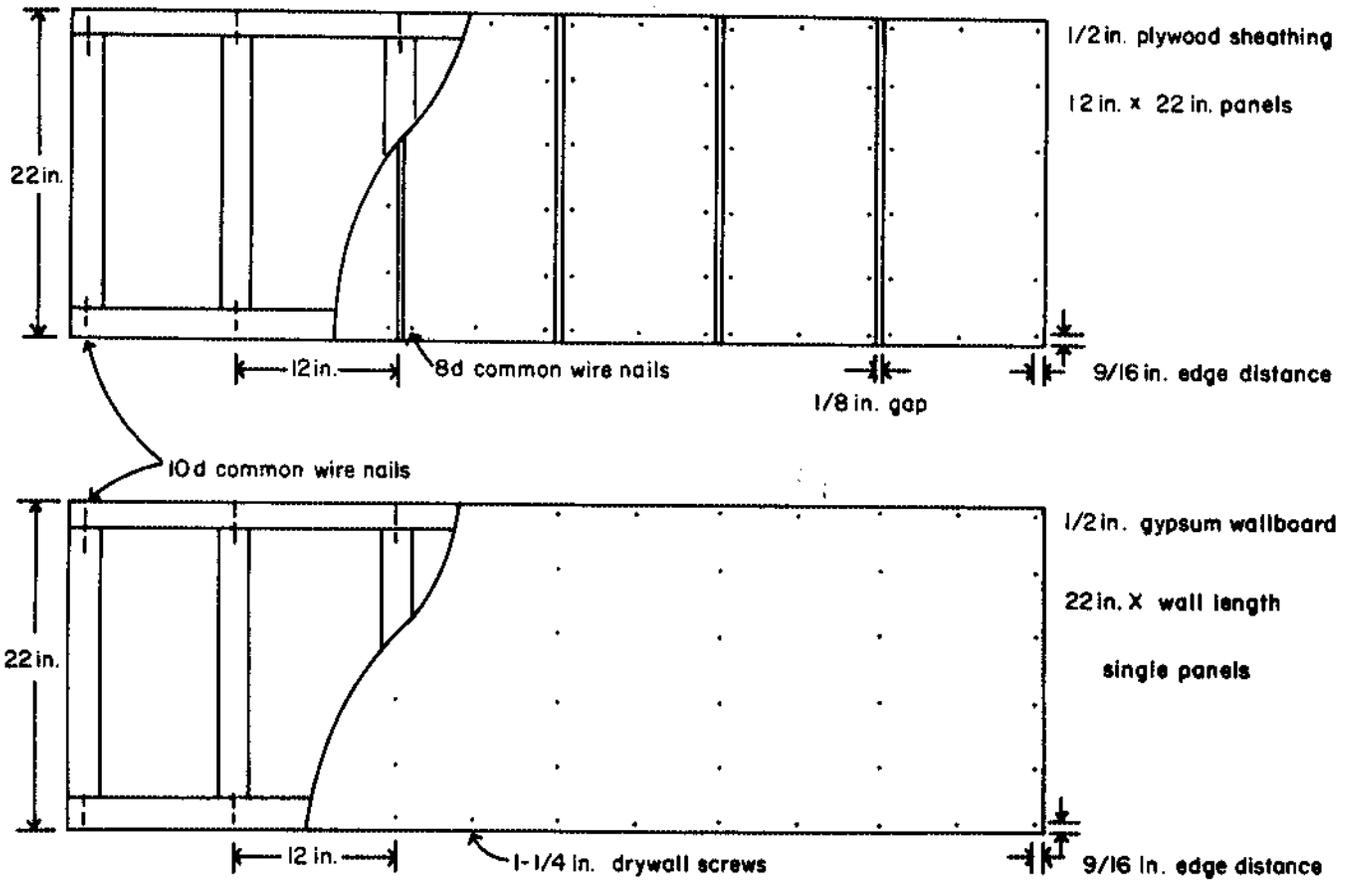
Typical wall construction used in wall racking test (6-foot wall used for illustration). (ML84 5245)
